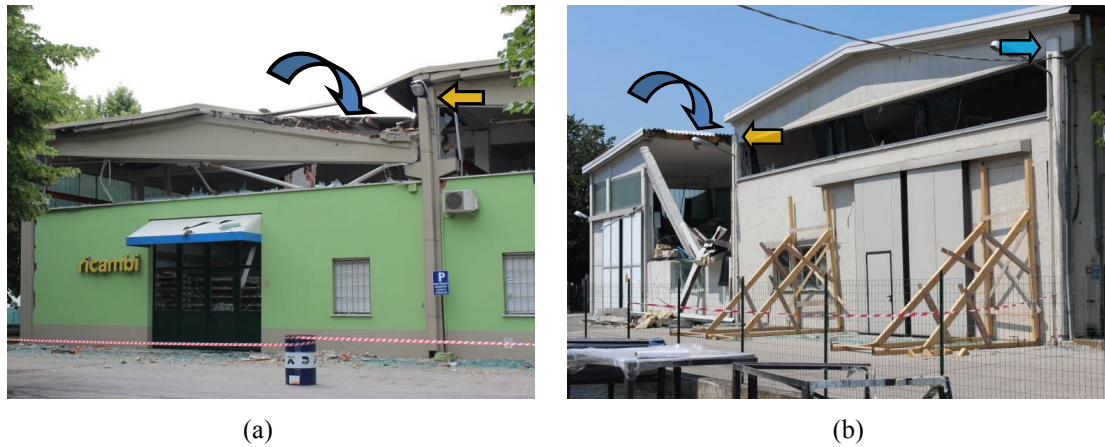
(a) Loss of beam seating from the central column and associated collapse of a double slope precast beam (the blue curved arrow shows direction of collapse and the orange arrow shows the intermediate beam); (b) Longer seating of the end beam at the external column (blue arrow).
